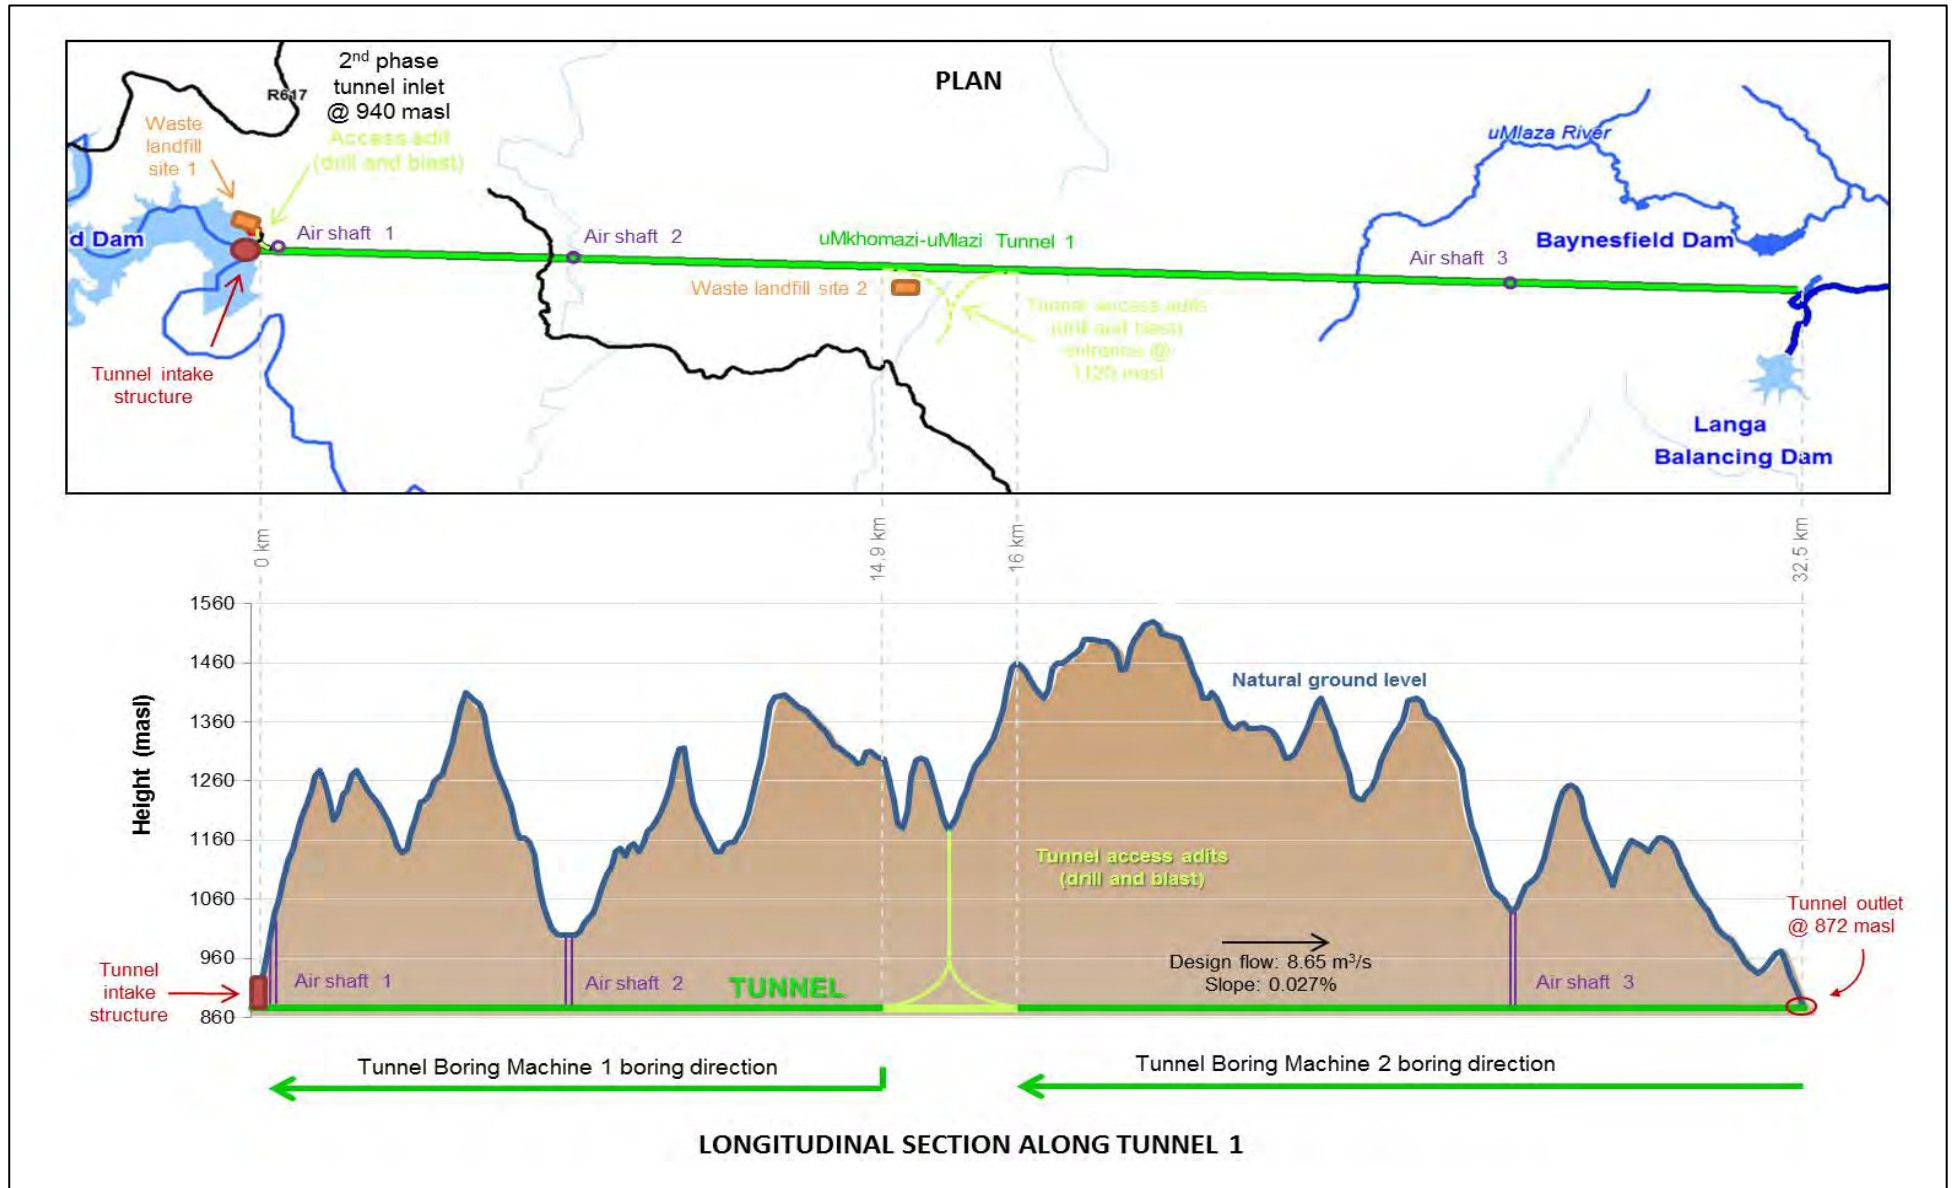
Tunnel Route and Longitudinal Tunnel Section along Tunnel 1
